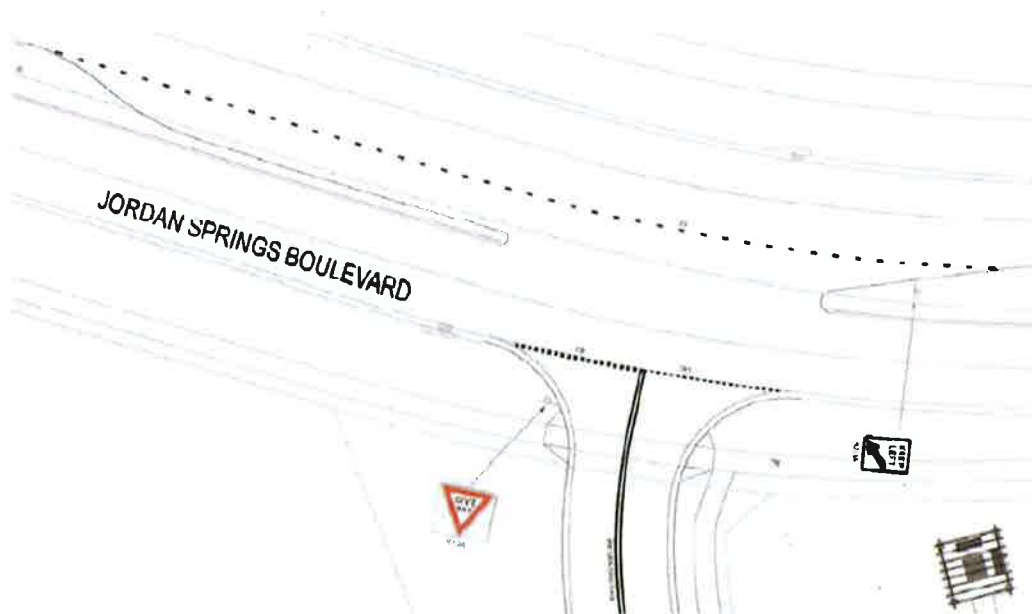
Proposed new access to site from Jordan Springs Boulevard (Source: Bitzios Consulting)
